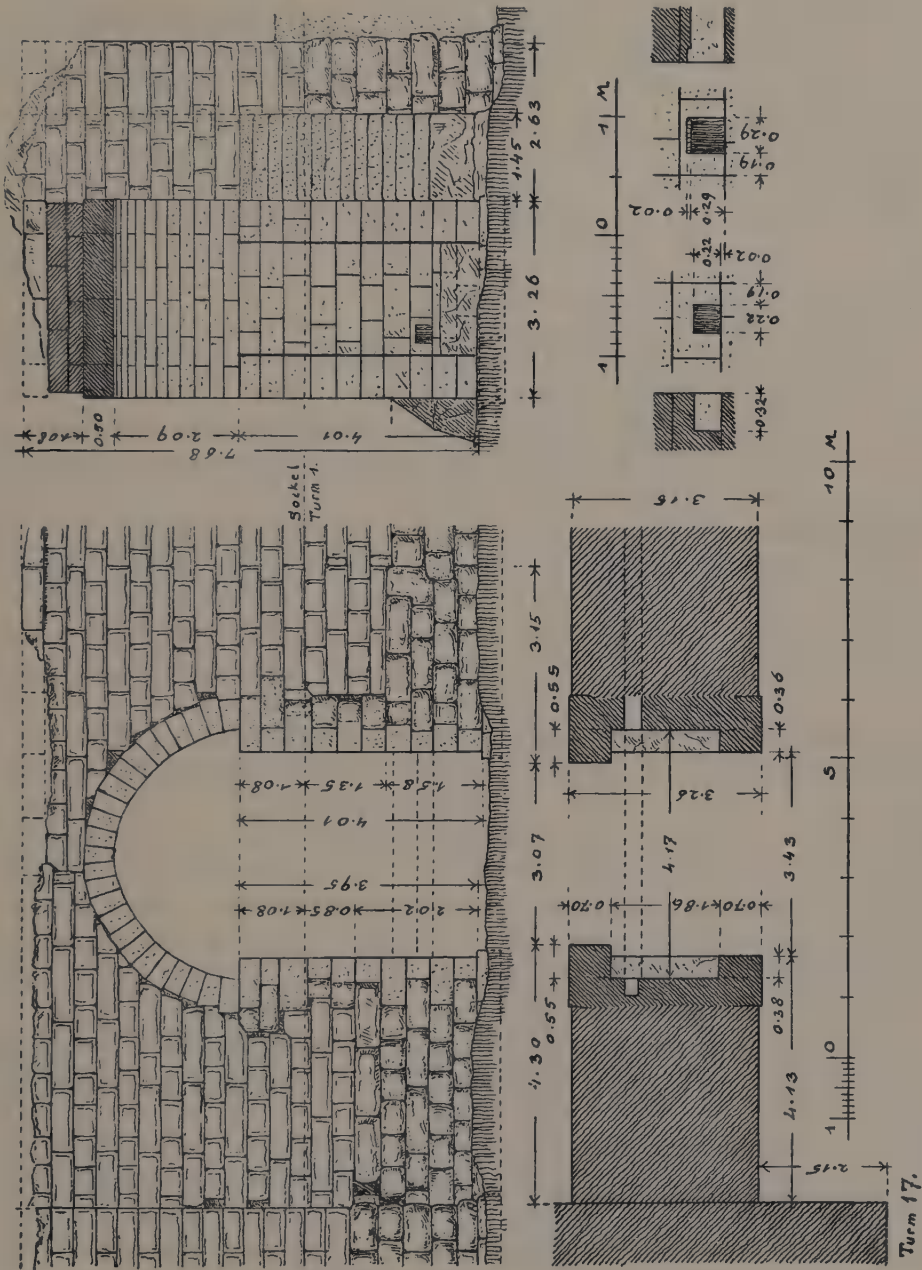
Plan, Section, and Elevation of the Gate North of Tower 17.
